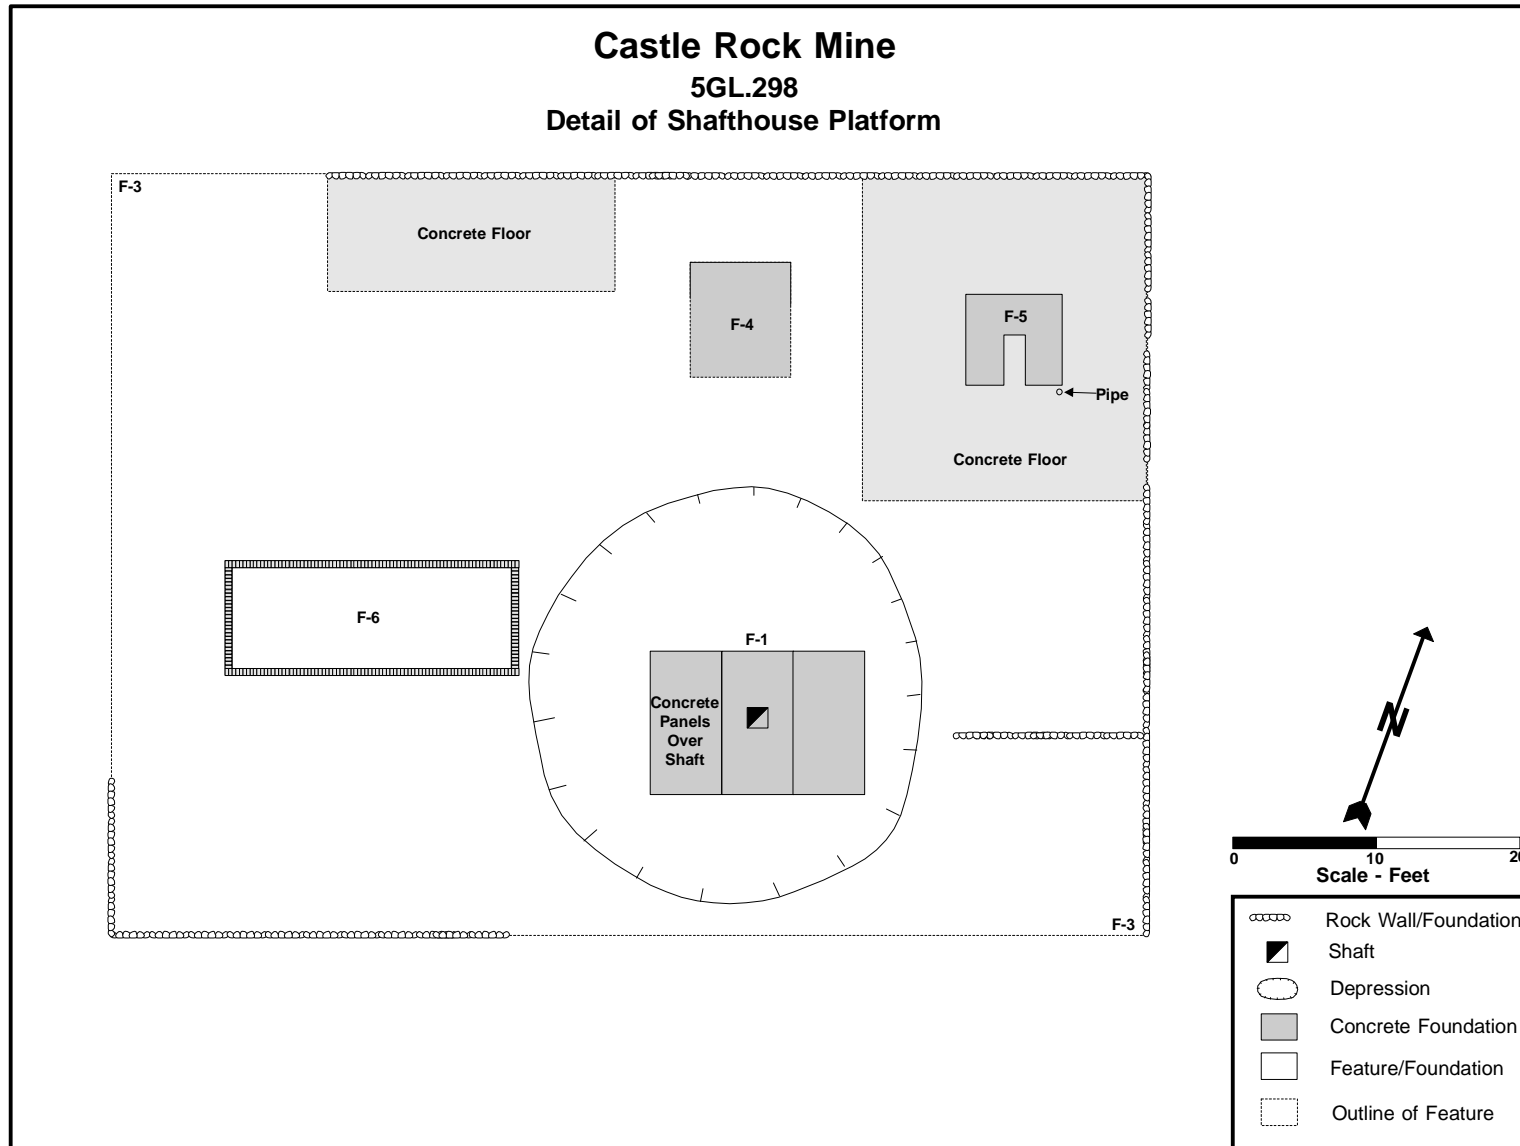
Detail plan view of the shaft house platform and machinery foundations (F3-F6).
